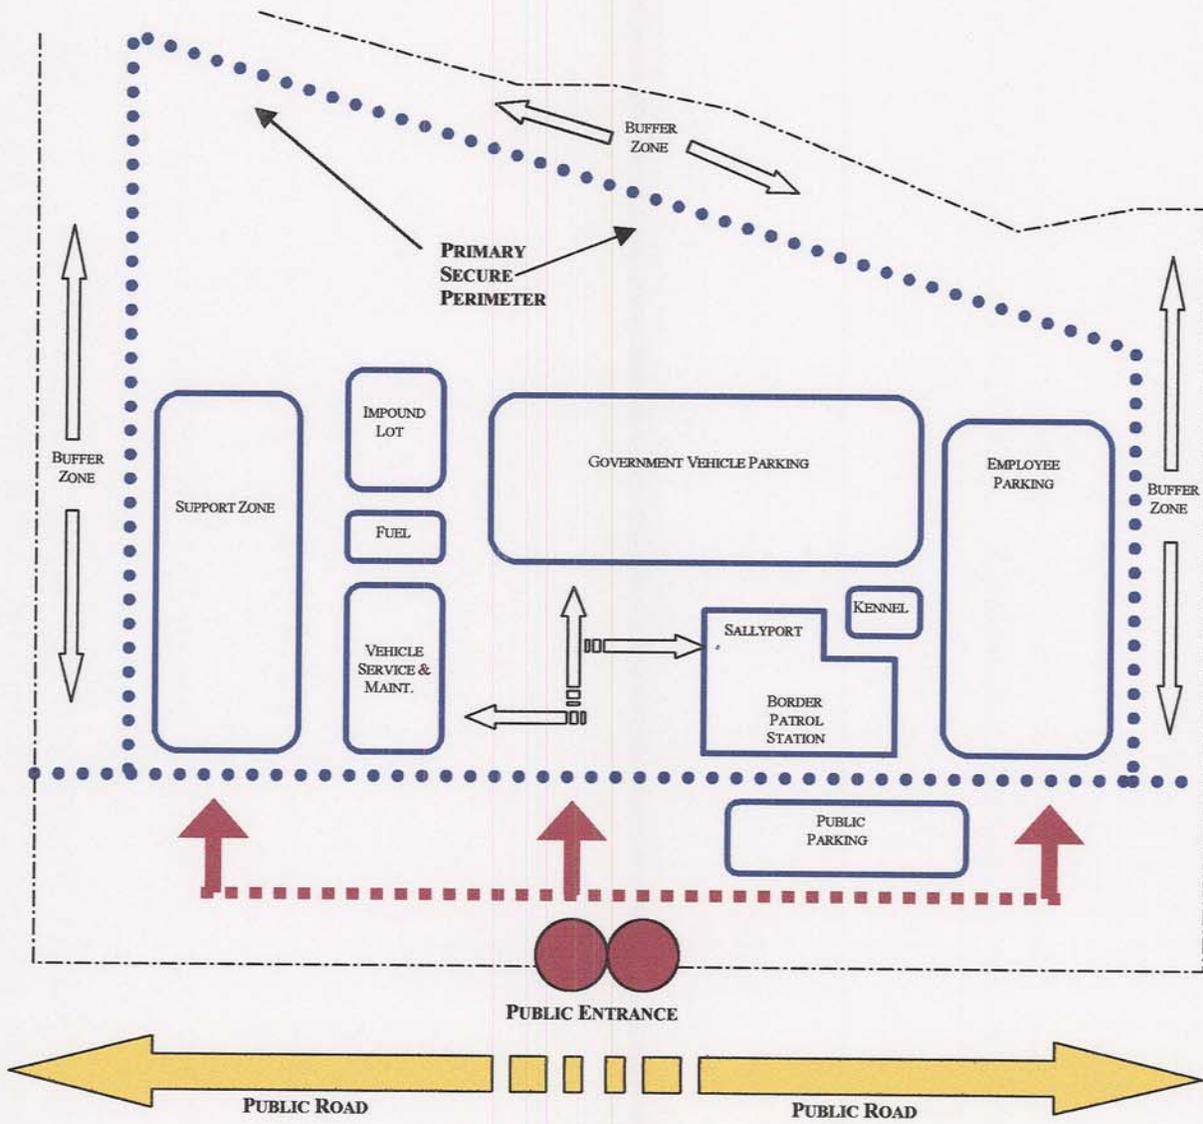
CONCEPT DRAWING FOR PROPOSED BORDER PATROL STATION
